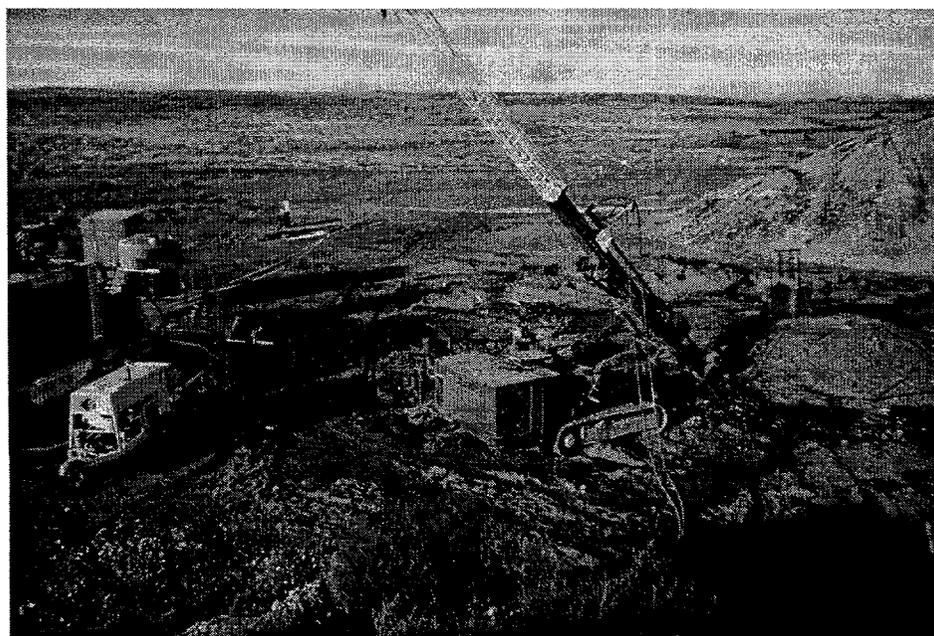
Casa Grande Jet Grouting Rig used at Hanford Demonstration.
